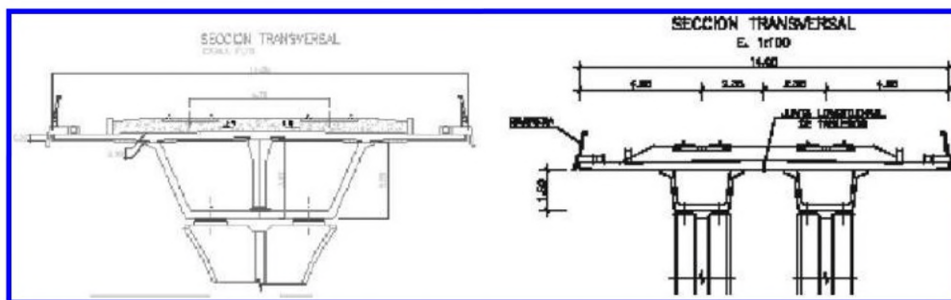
Attached double box and double box beam sections of precast bridges (Courtesy of PRAINSA).
